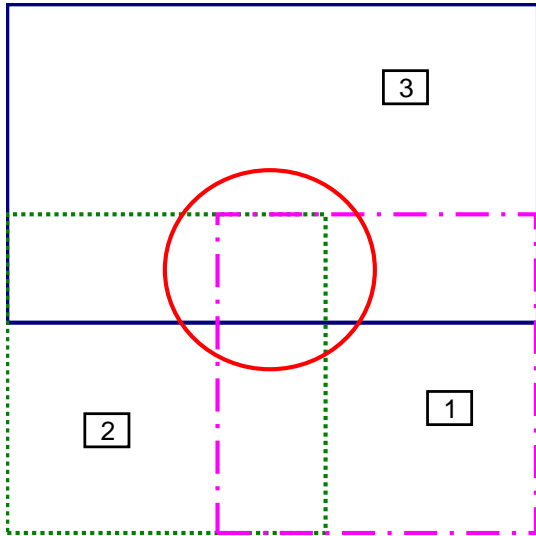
Layout of the membrane sheets (no. in box indicates order of lying)
